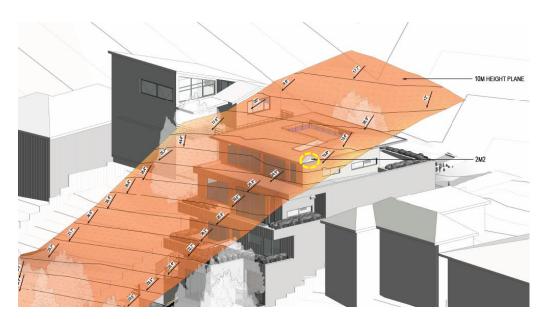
the slope of the site, nature and location of the 10-metre height of building exception
